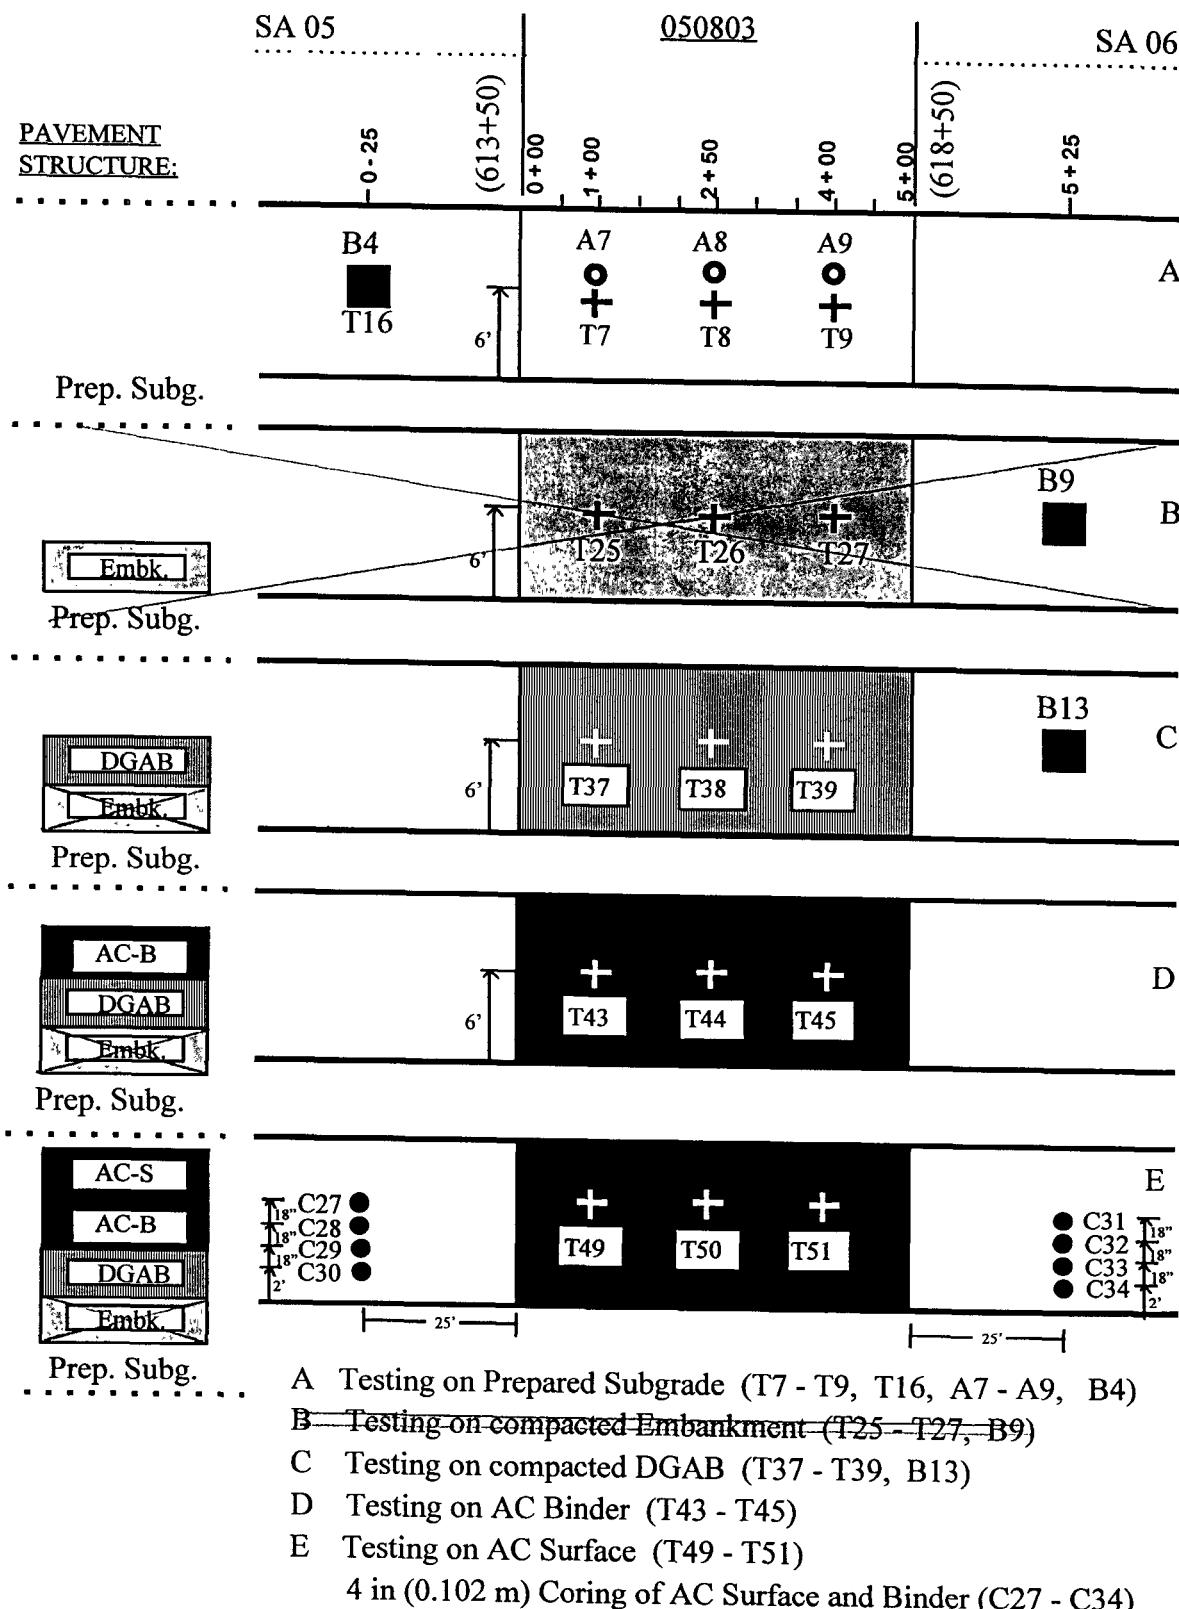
SAMPLING AND TESTING PLAN FOR TEST SECTION 050803
